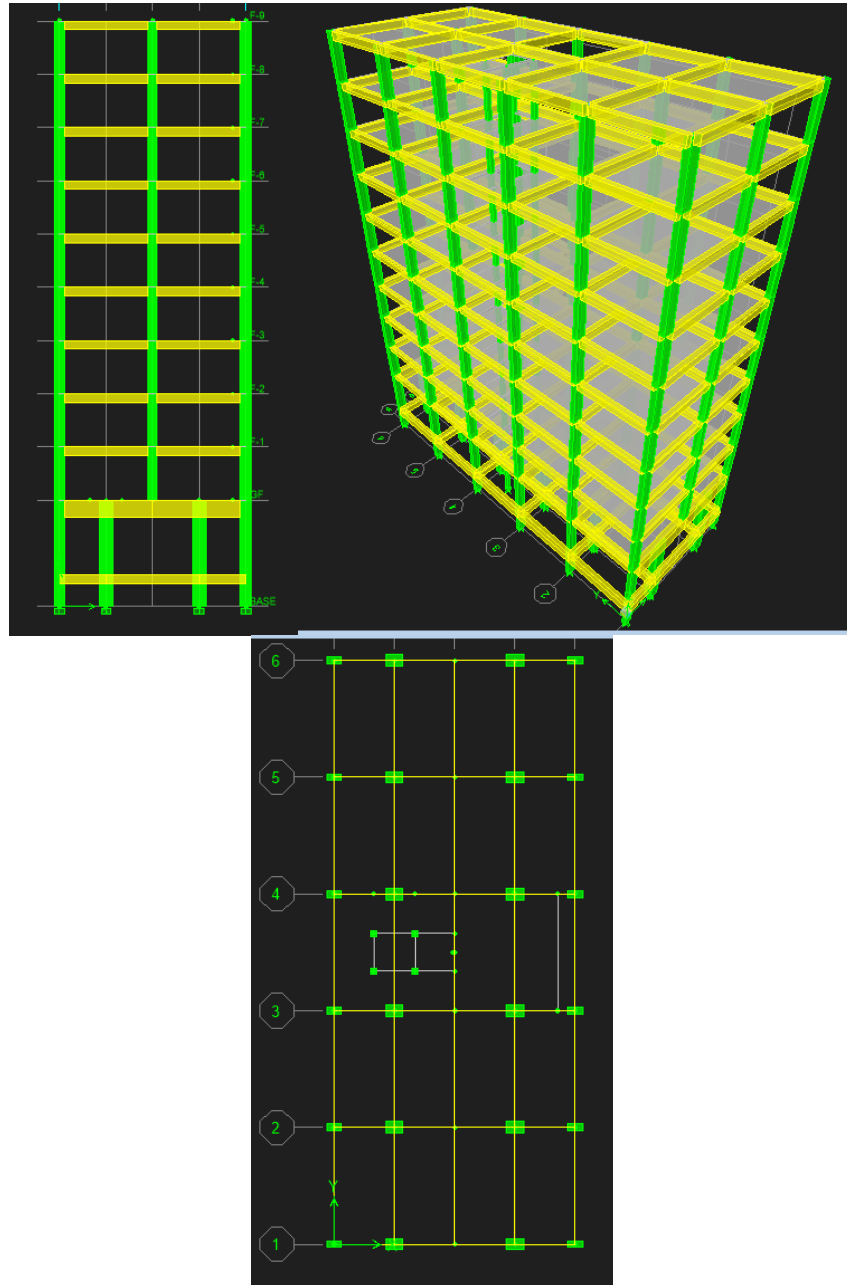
Elevation view, 3D view and ground floor plan view of case 4
